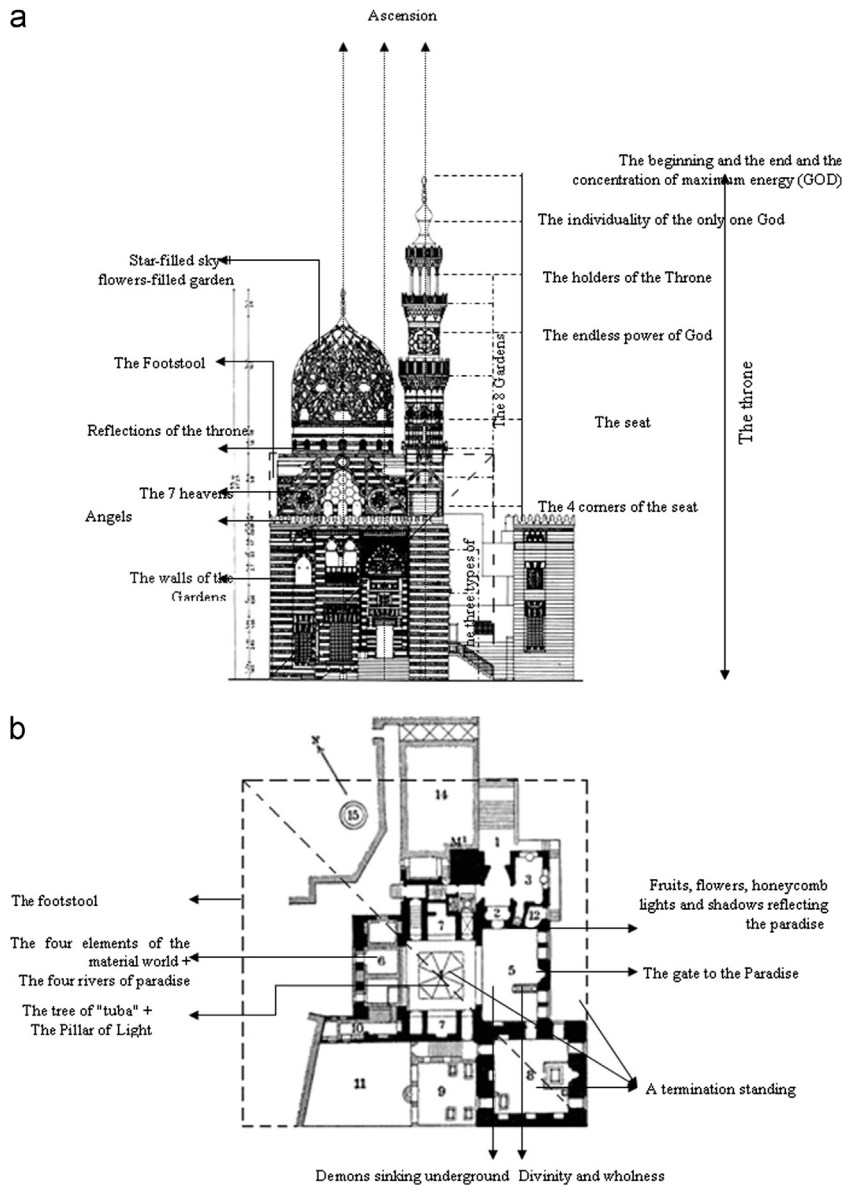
Interpretation diagram (a) façade and (b) plan.
